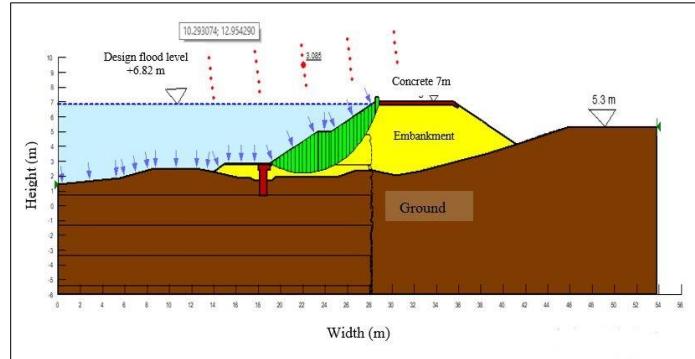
The location of dangerous sliding surface (Concrete revetment), when having load (Geoslope)
